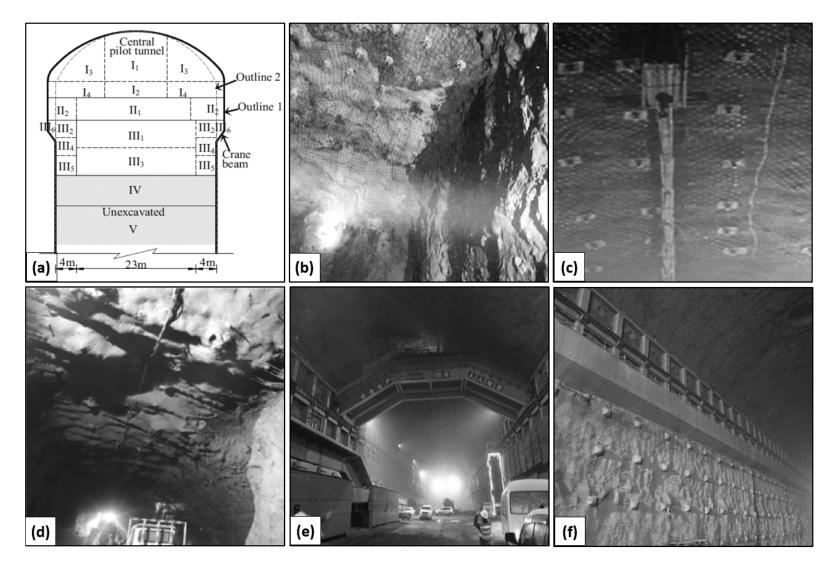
Construction Stage at the main caverns of the project, (a) sequential excavation, (b) installing wire mesh, (c) installing rock bolt, (d) sprayed shotcrete on the surface excavation, (e) installing concrete, (f) completed construction
